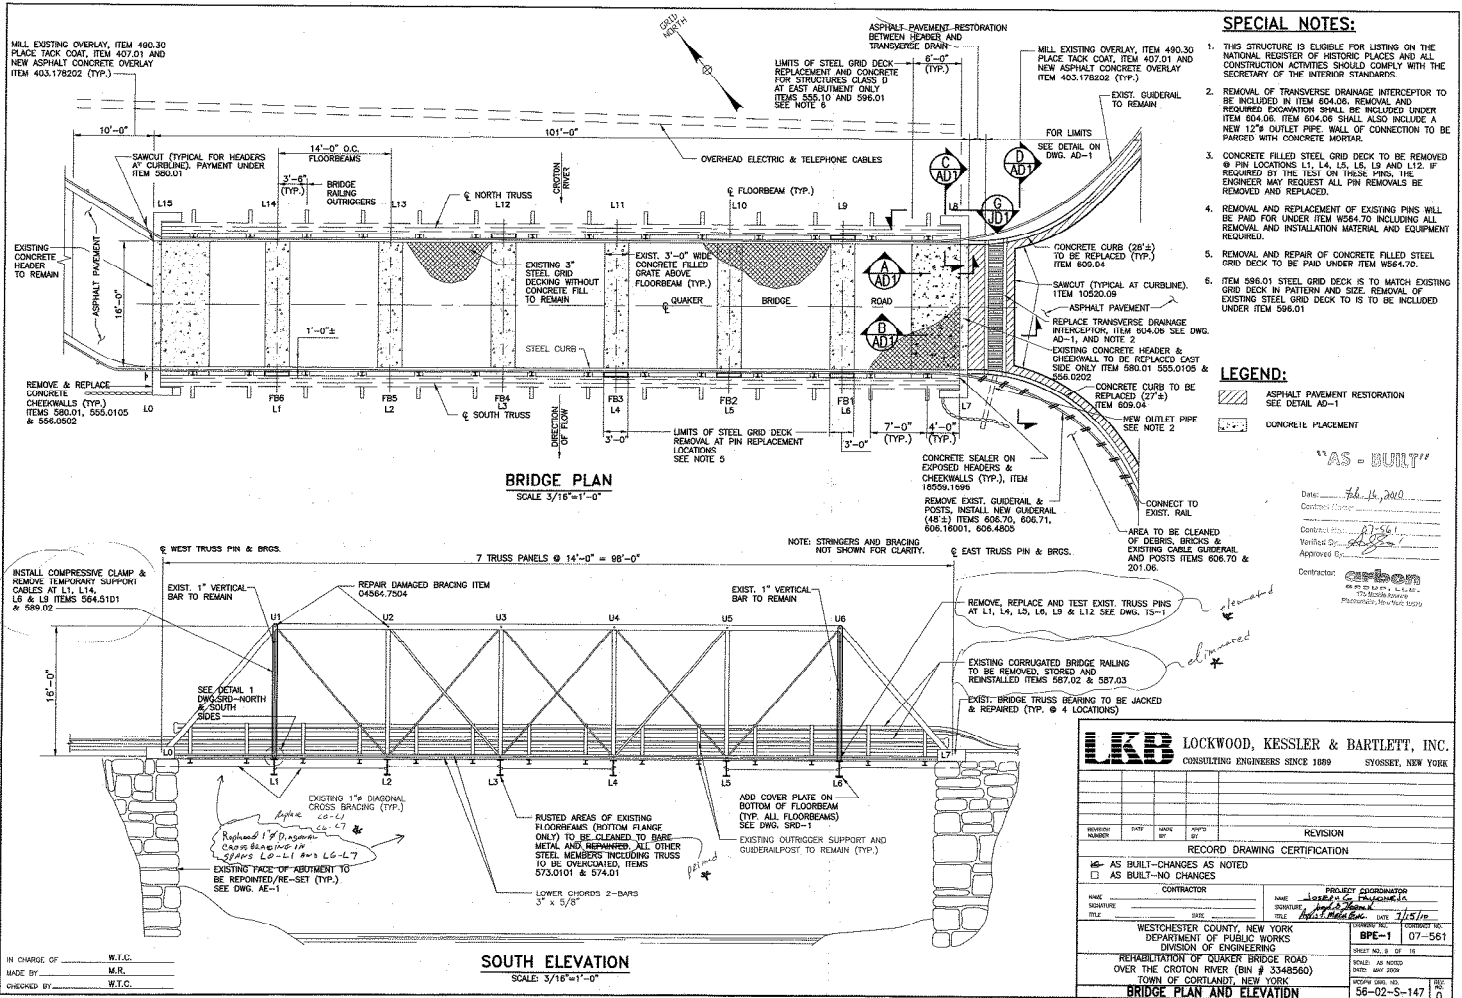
Plan and elevation of the bridge, as-builts, 2010 (Lockwood, Kessler & Bartlett, Inc., on file at Westchester County Department of Public Works and Transportation).
